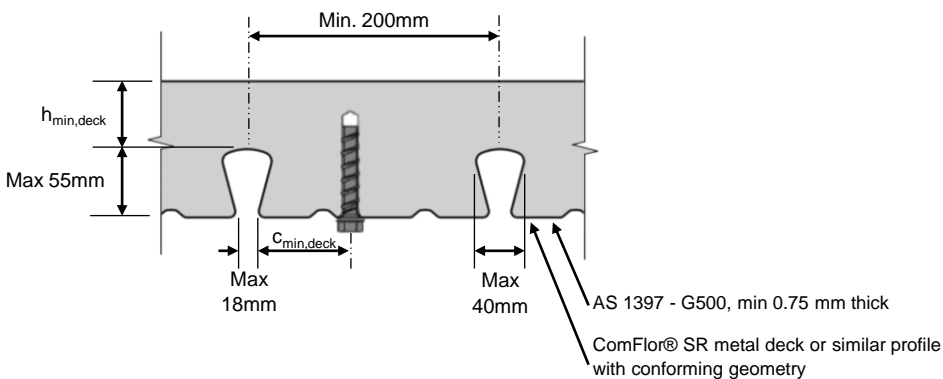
Hilti HUS4 in the soffit of concrete filled re-entrant profile steel deck assemblies
